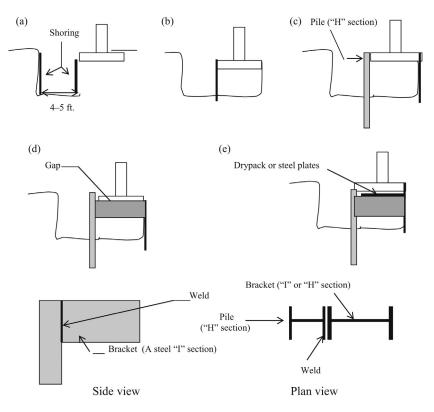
Underpinning with driven piles. (a) Construct an approach pit. (b) Dig underneath the footing. (c) Drive a pile outside the footing to the desired depth. (d) Provide a bracket with a gap (Bracket detail shown below). (e) Place drypack or ram steel plates into the gap.
